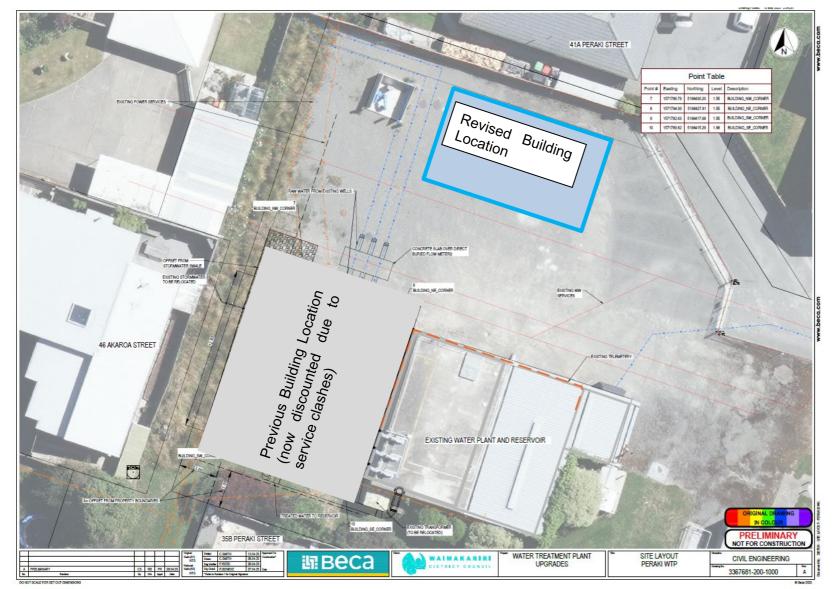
Proposed Peraki Street Layout (note blue outline represents proposed building outline, grey area shows previous location that has since been discounted)
